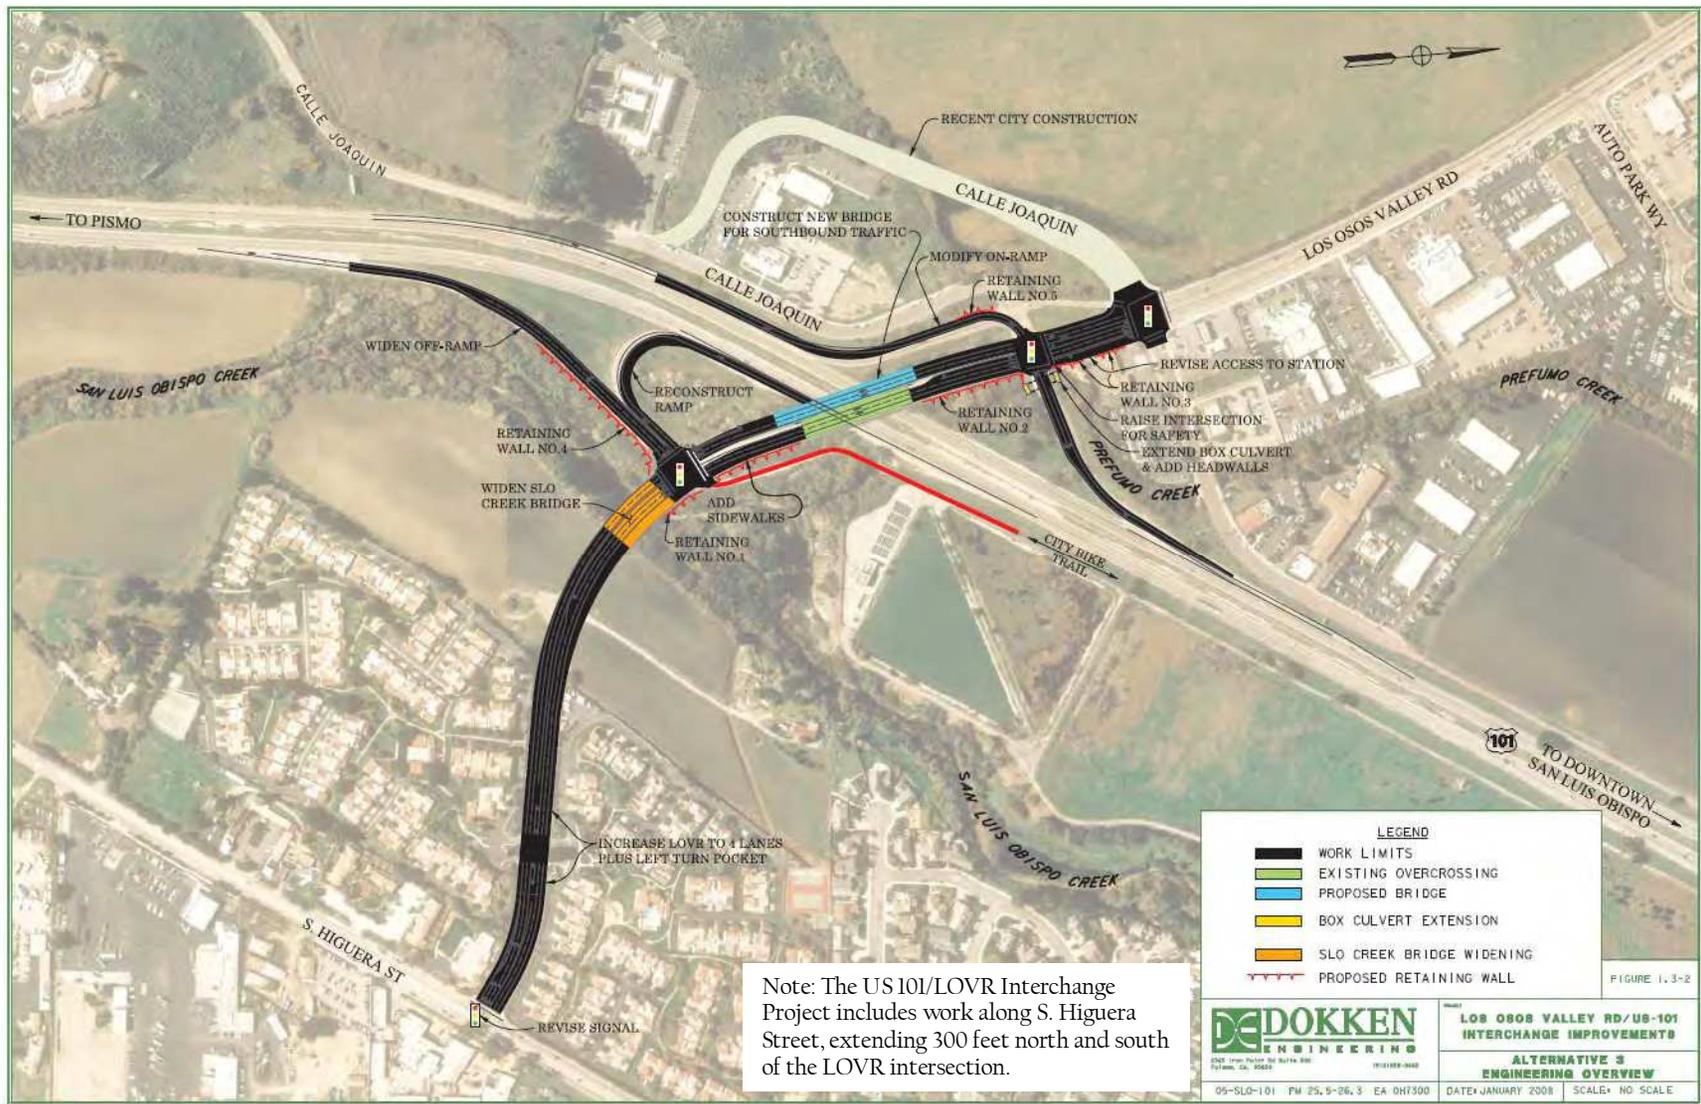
US 101 / LOVR Interchange Reinvestment/Improvement Project (Alternative 3) showing the City's planned Bob Jones Pathway segment (solid red line) and new crosswalks at the LOVR / US 101 northbound on- and off-ramp intersection
